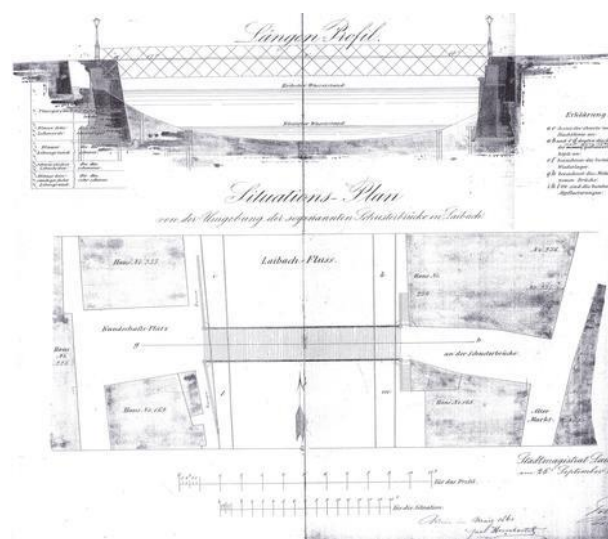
Carl Hornbostel's 1860 competition plan of an iron beam truss bridge [ZAL, 1861].
